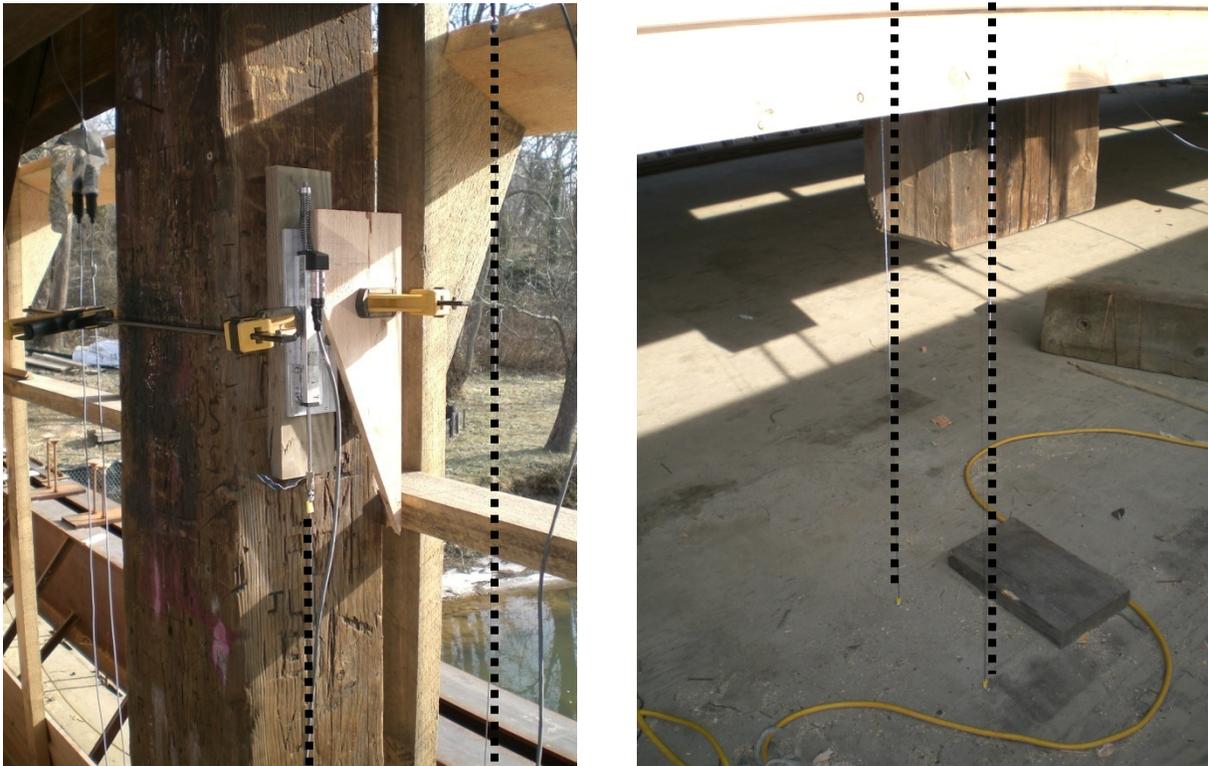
Position transducers were connected to the kingpost and lower arch on the east truss at midspan (wires used to connect the position transducers to ground are highlighted for clarity). Photographs by Rachel H. Sangree.
